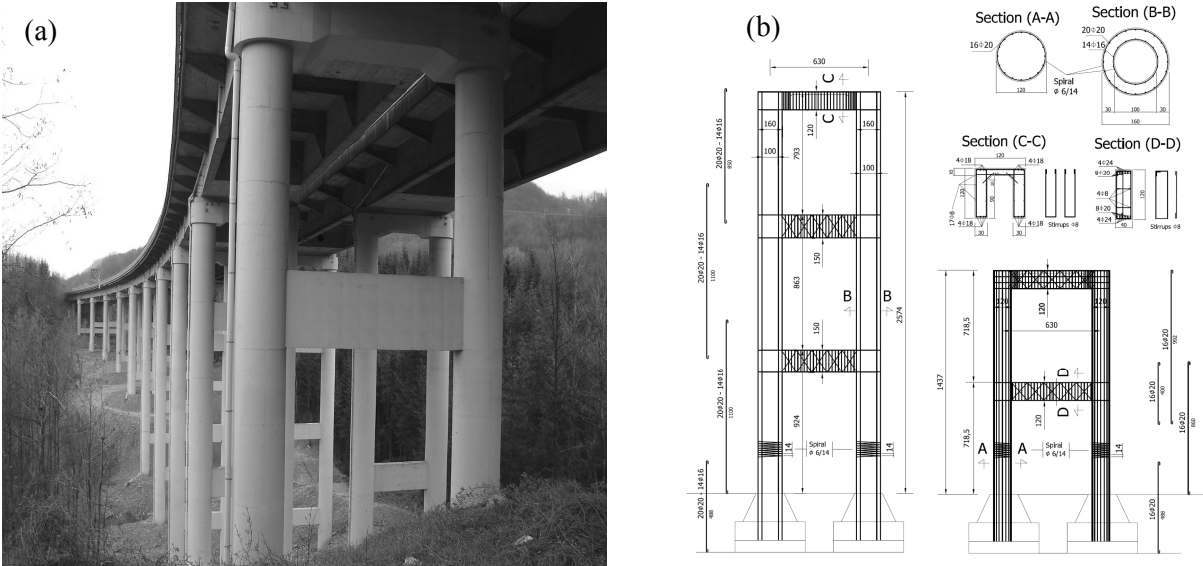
(a) Frontal view of the bridge, (b) Reinforcement details of pier 9 and 11
